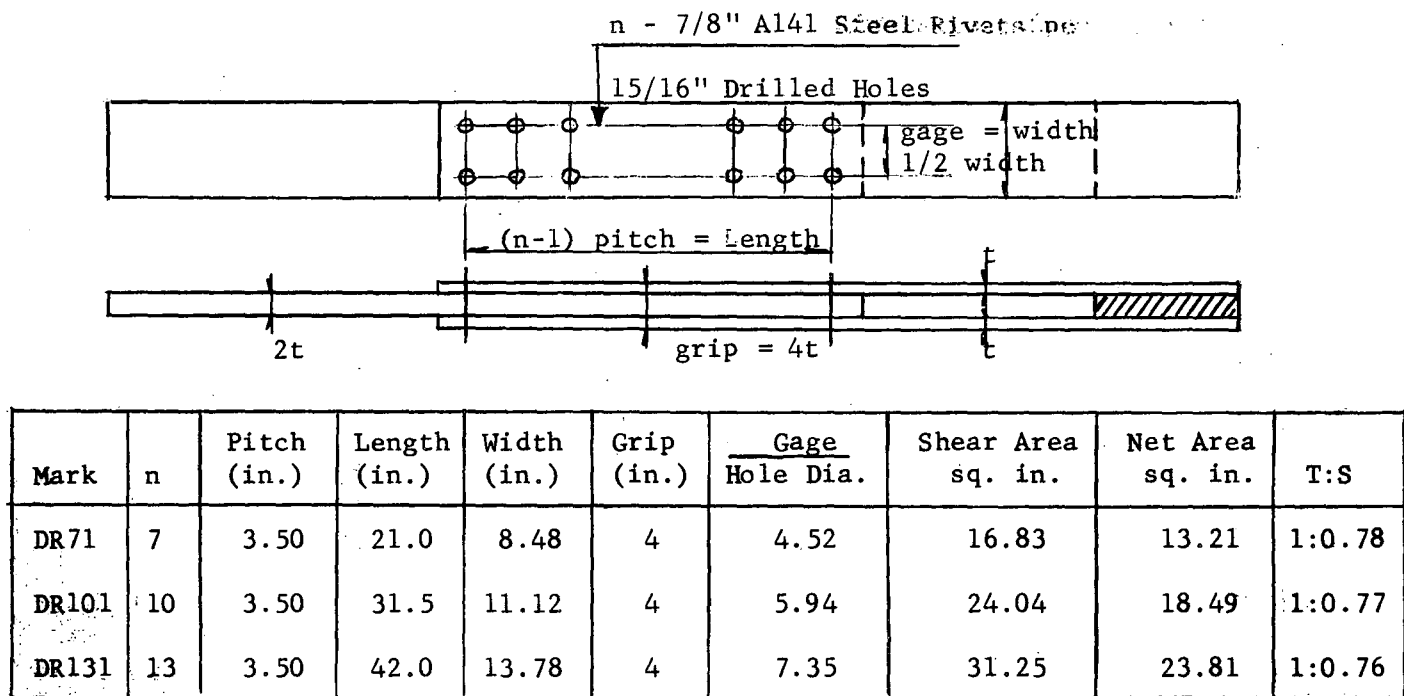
NOMINAL DIMENSIONS OF RIVETED BUTT JOINTS
